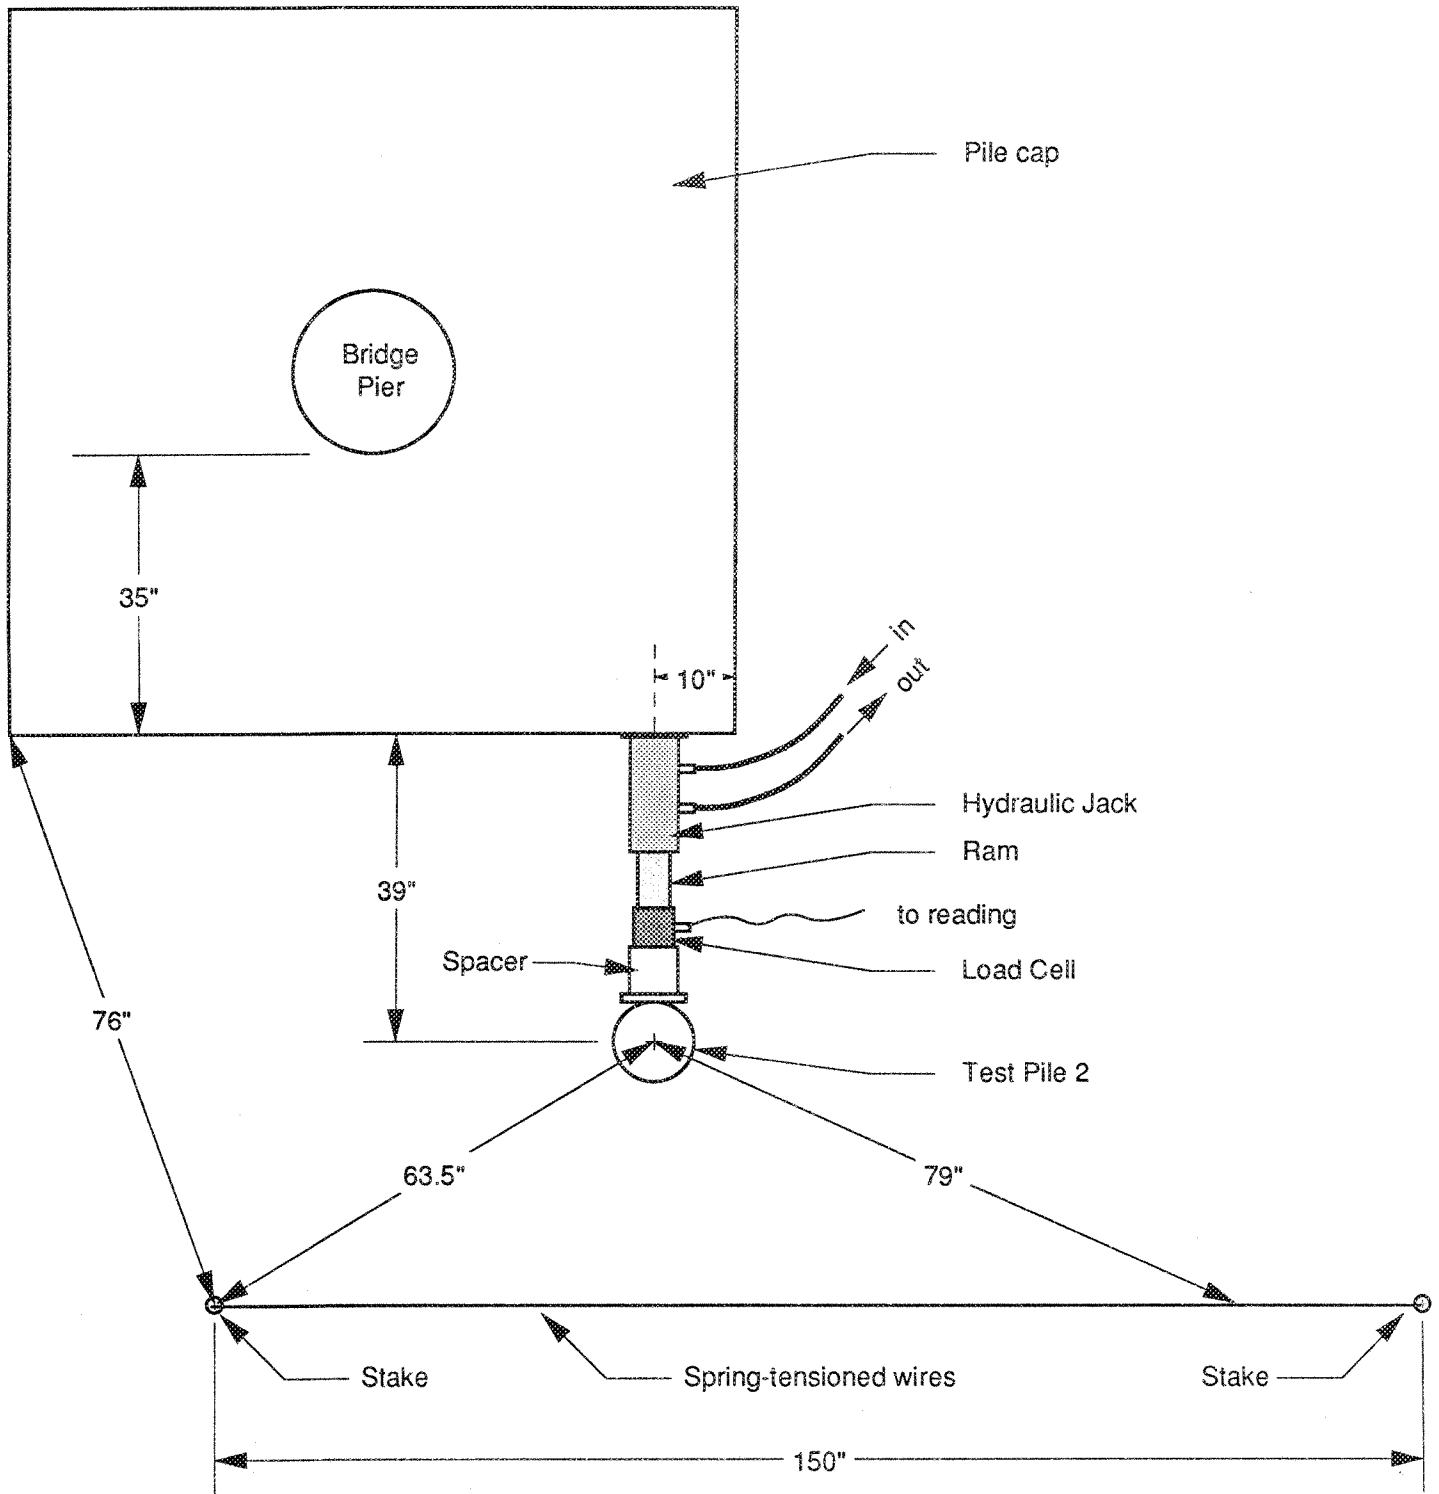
Plan View of Mercer Slough TP2 Test Setup
